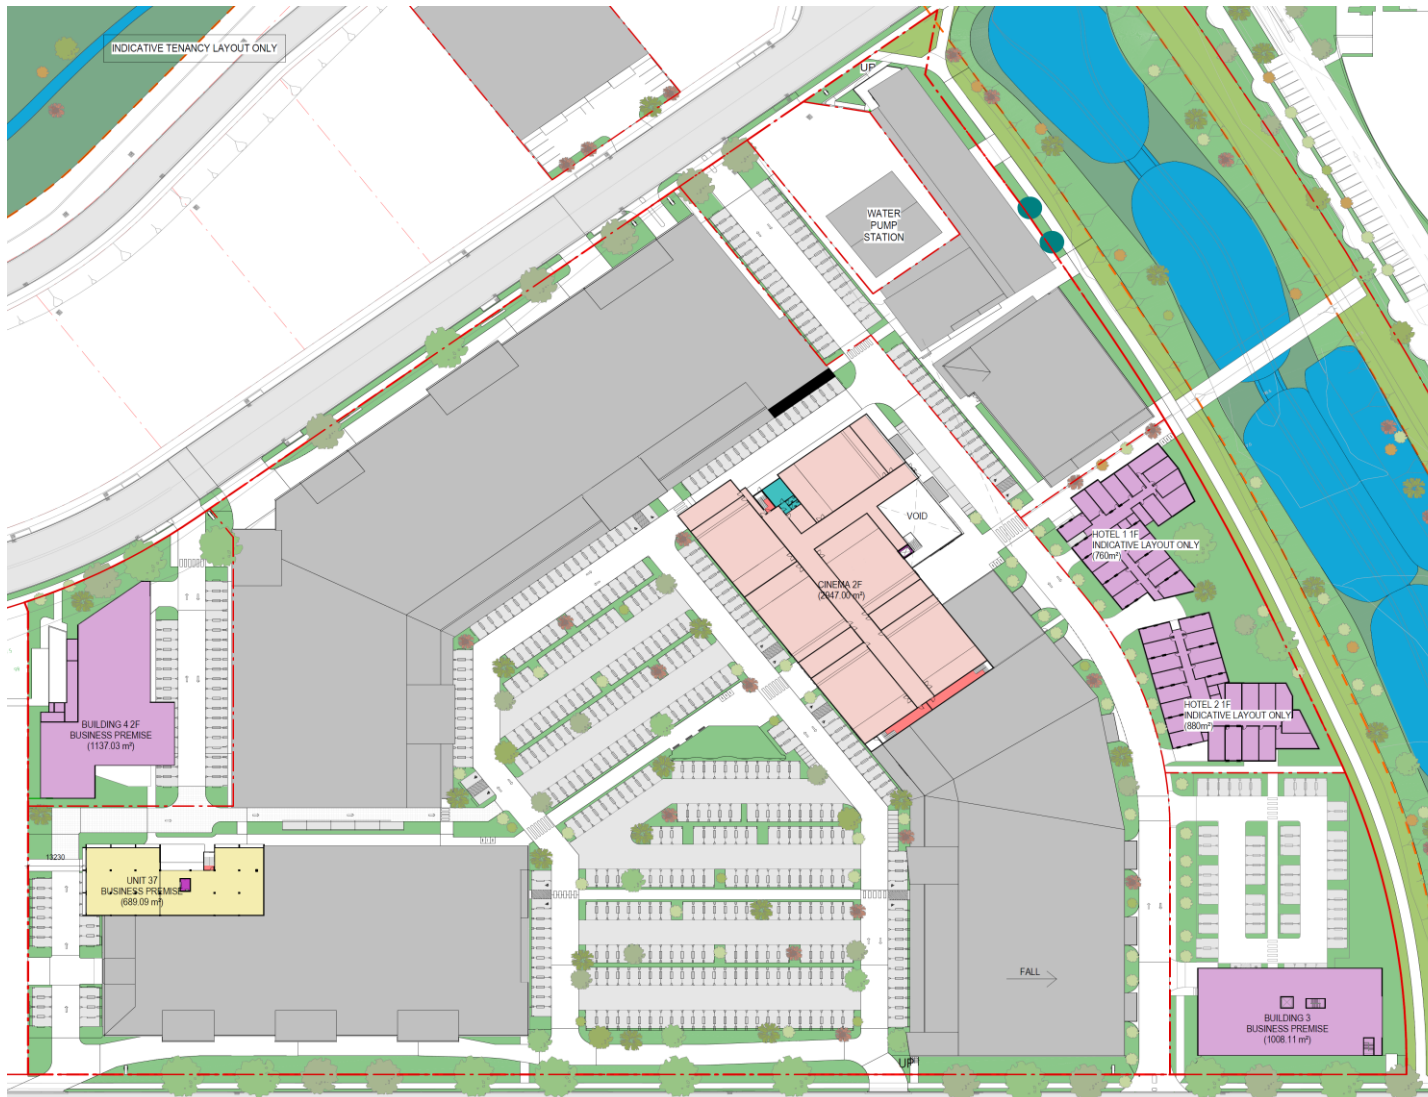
SOMA LIFESTYLE PRECINCT - GREGORY HILLS CORPORATE PARK, SECOND LEVEL FLOOR PLAN
